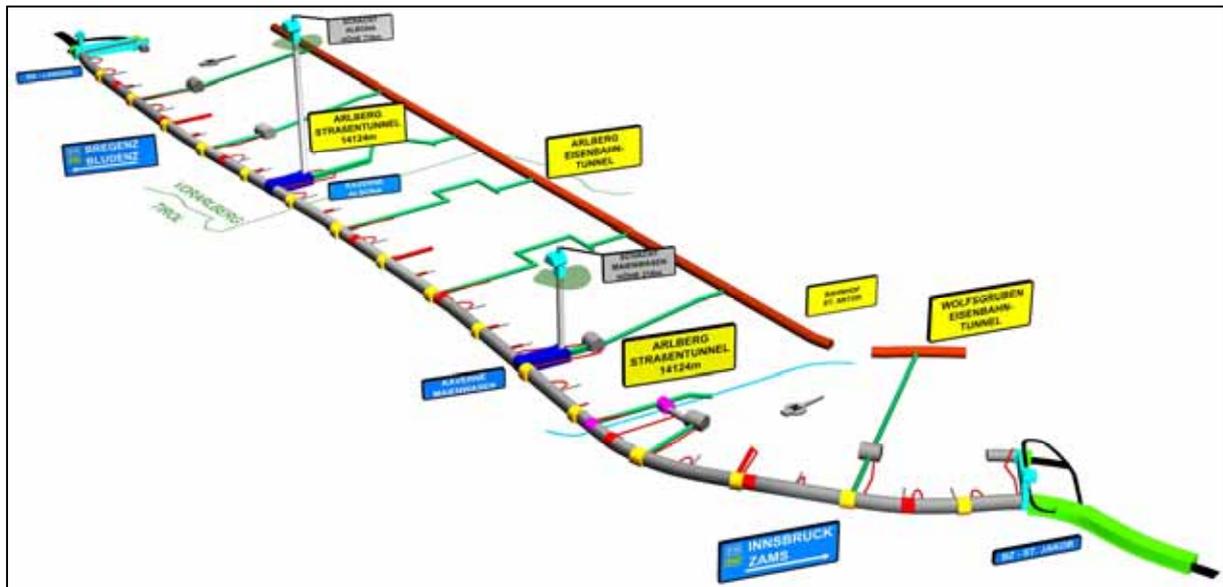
Sketch of the egress ways of the Arlberg tunnel (© AISFINAG).
